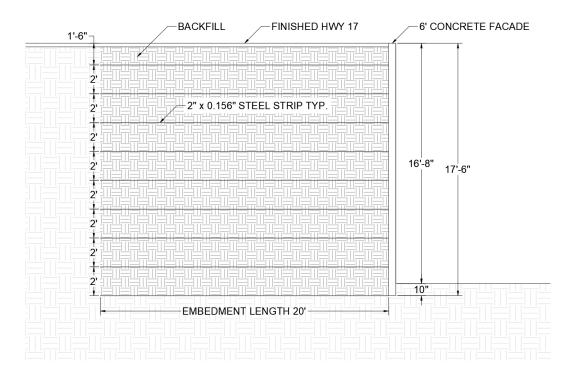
Elevation view of the MSE design for each end of the finished culvert.
